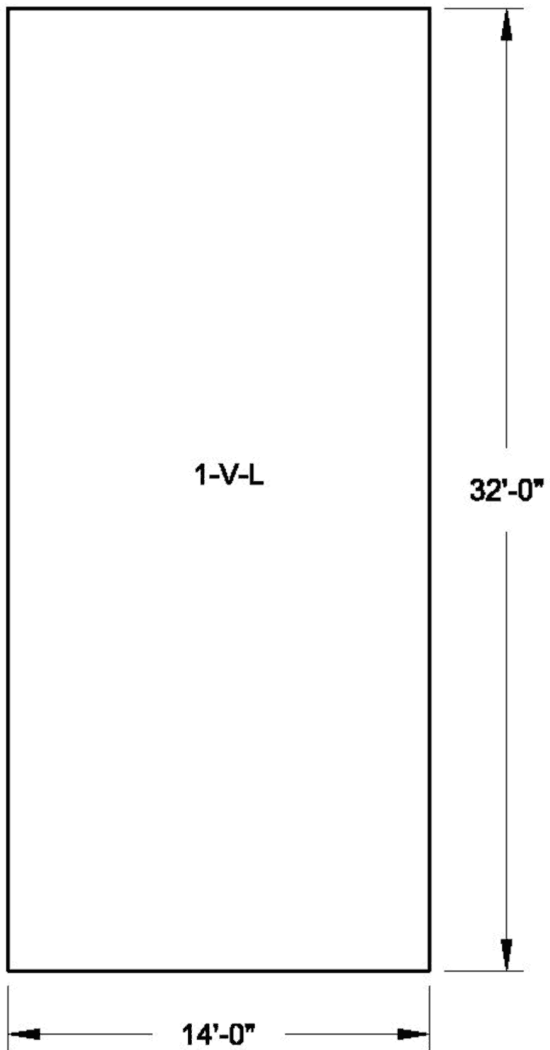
H.6-156 DGFOV Roof 5 Looking Down
